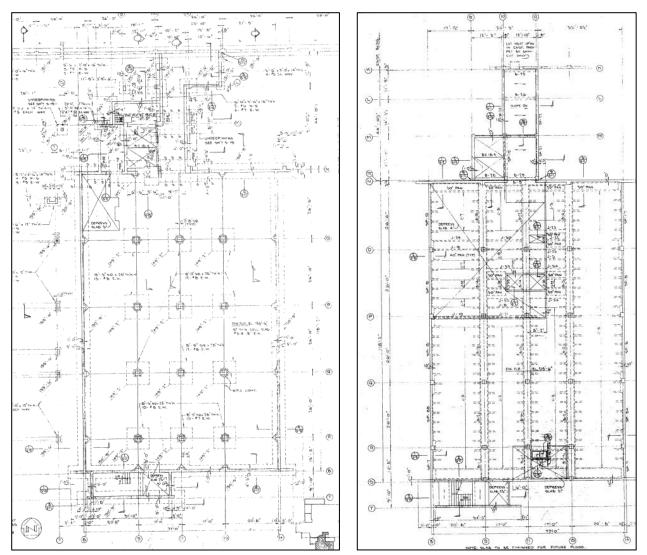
Foundation and Basement Plan (Left), Roof Level Plan (Right) (South Tower and Elevator Tower)
